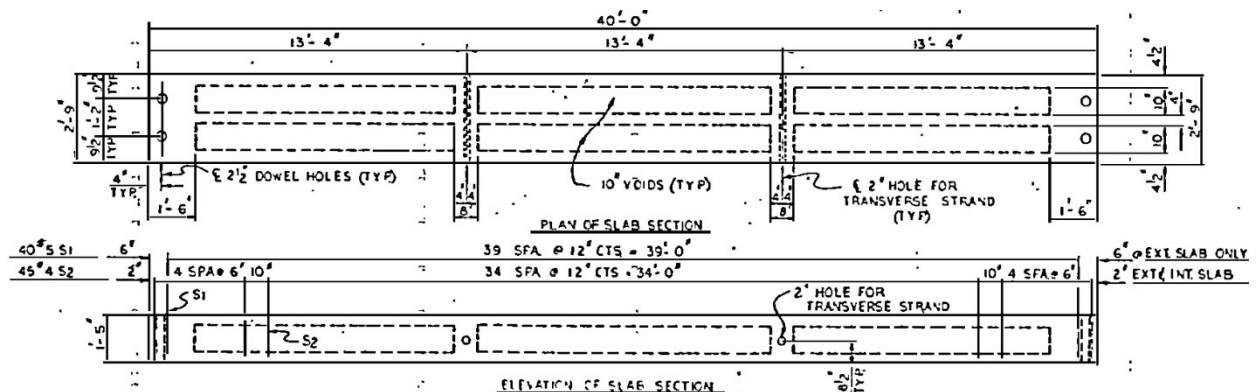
Plan and Elevation Sections from Ward Creek Bridge plans
